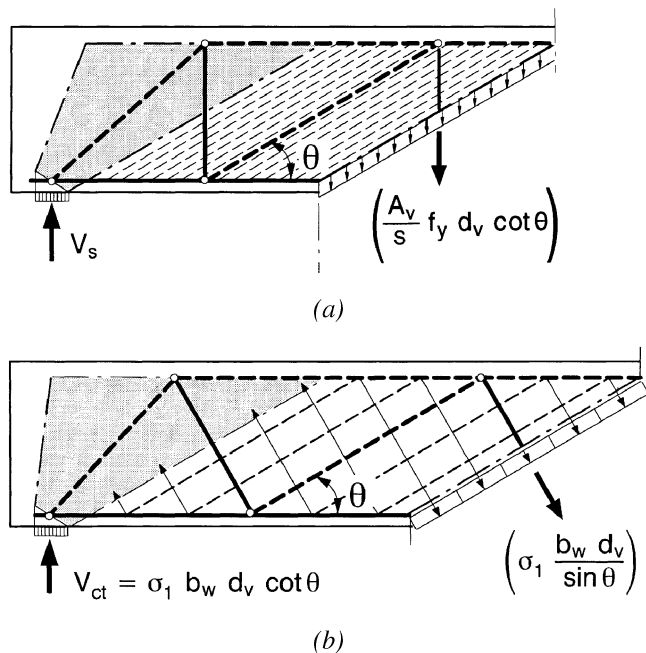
Smeared truss-models corresponding to principal struts between cracks as proposed by Reineck (1991a): (a) truss with uniaxial compression field; and (b) truss with biaxial tension-compression field.
